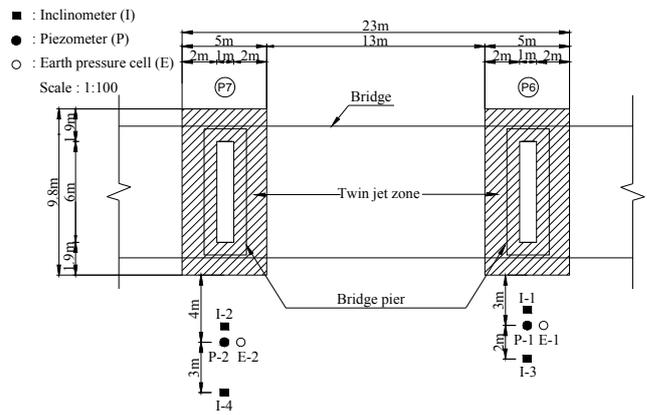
Plan view of layout of soil improvement zones and monitoring instruments
